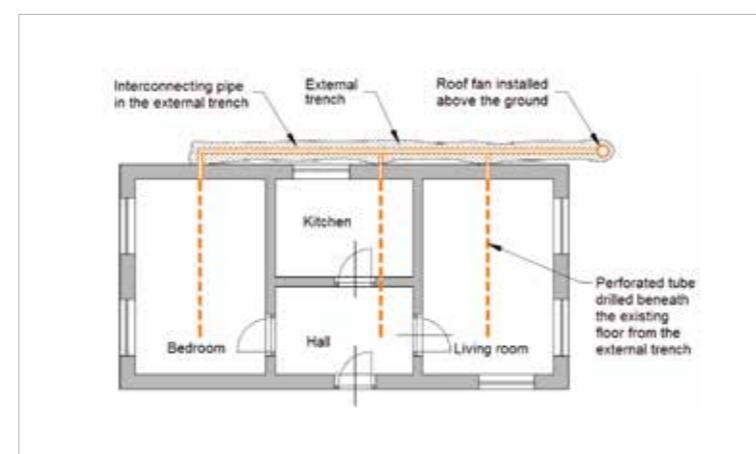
Perforated tubes drilled into the sub-floor layer from the external trench
